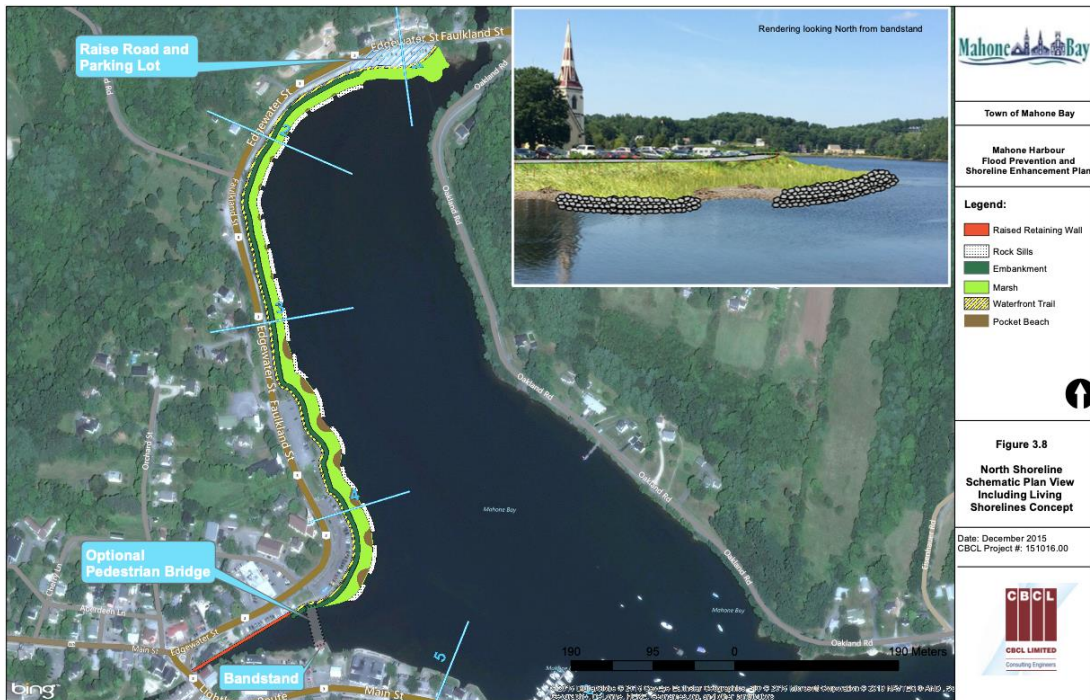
Project design for Edgewater Street (CBCL, 2016)
